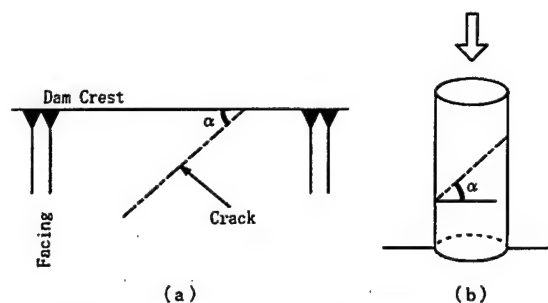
Direction of Cracks generated on Asphalt Facing
